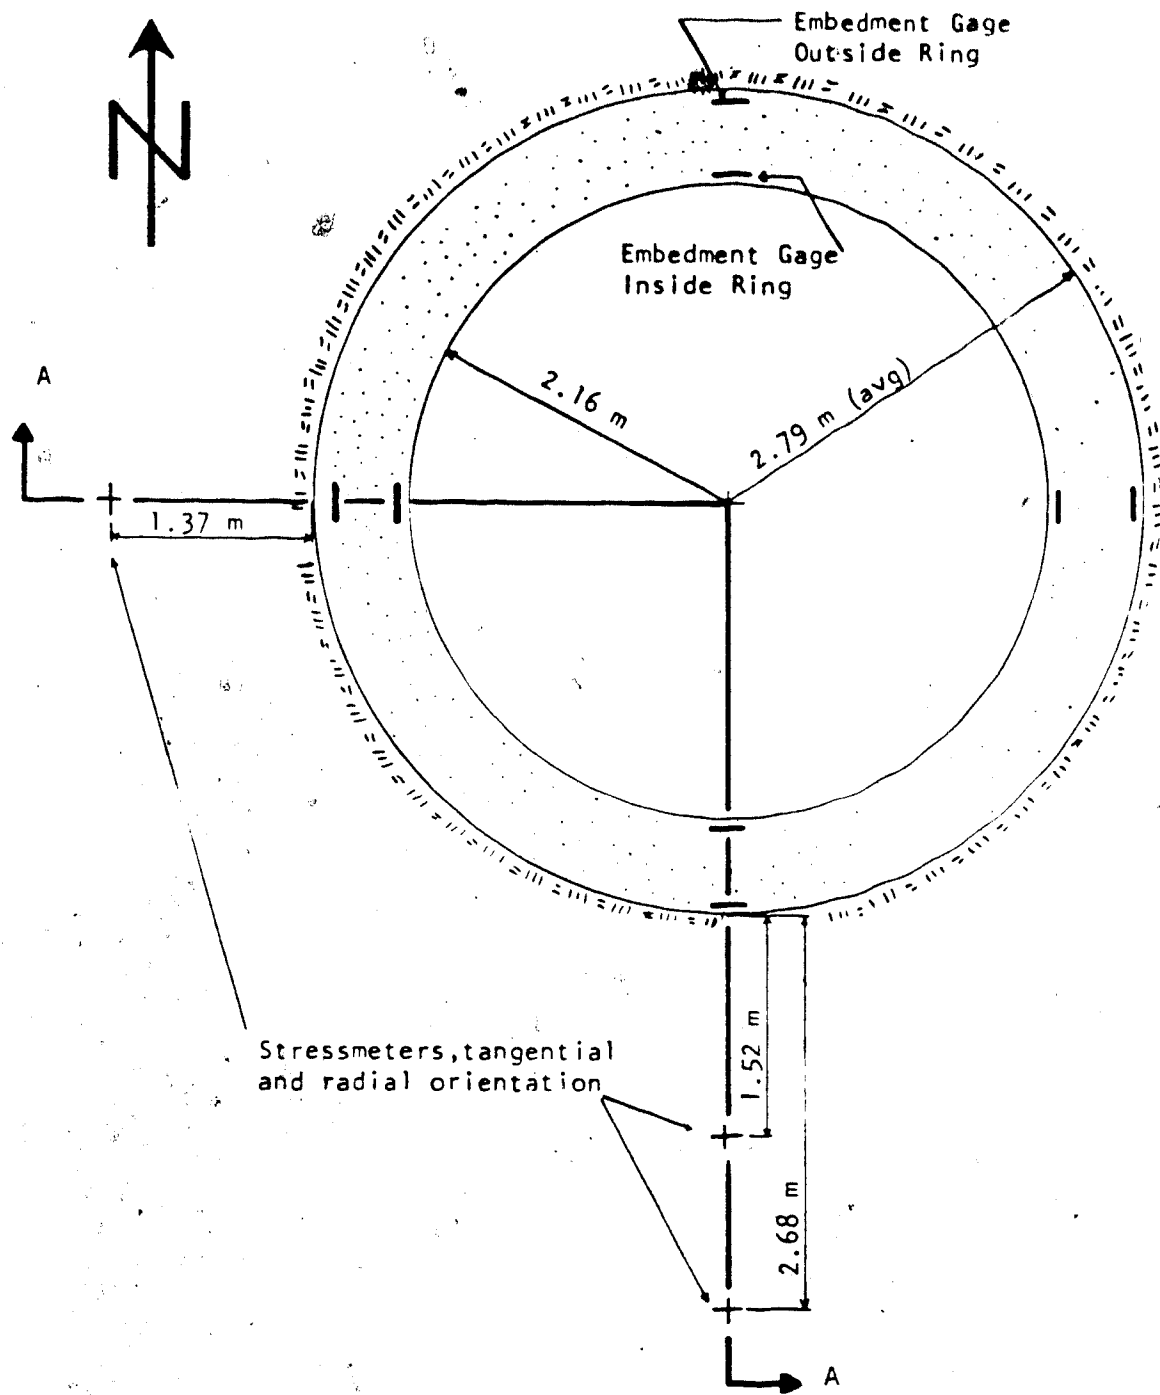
Plan View of Stressmeters at 152 m Depth
